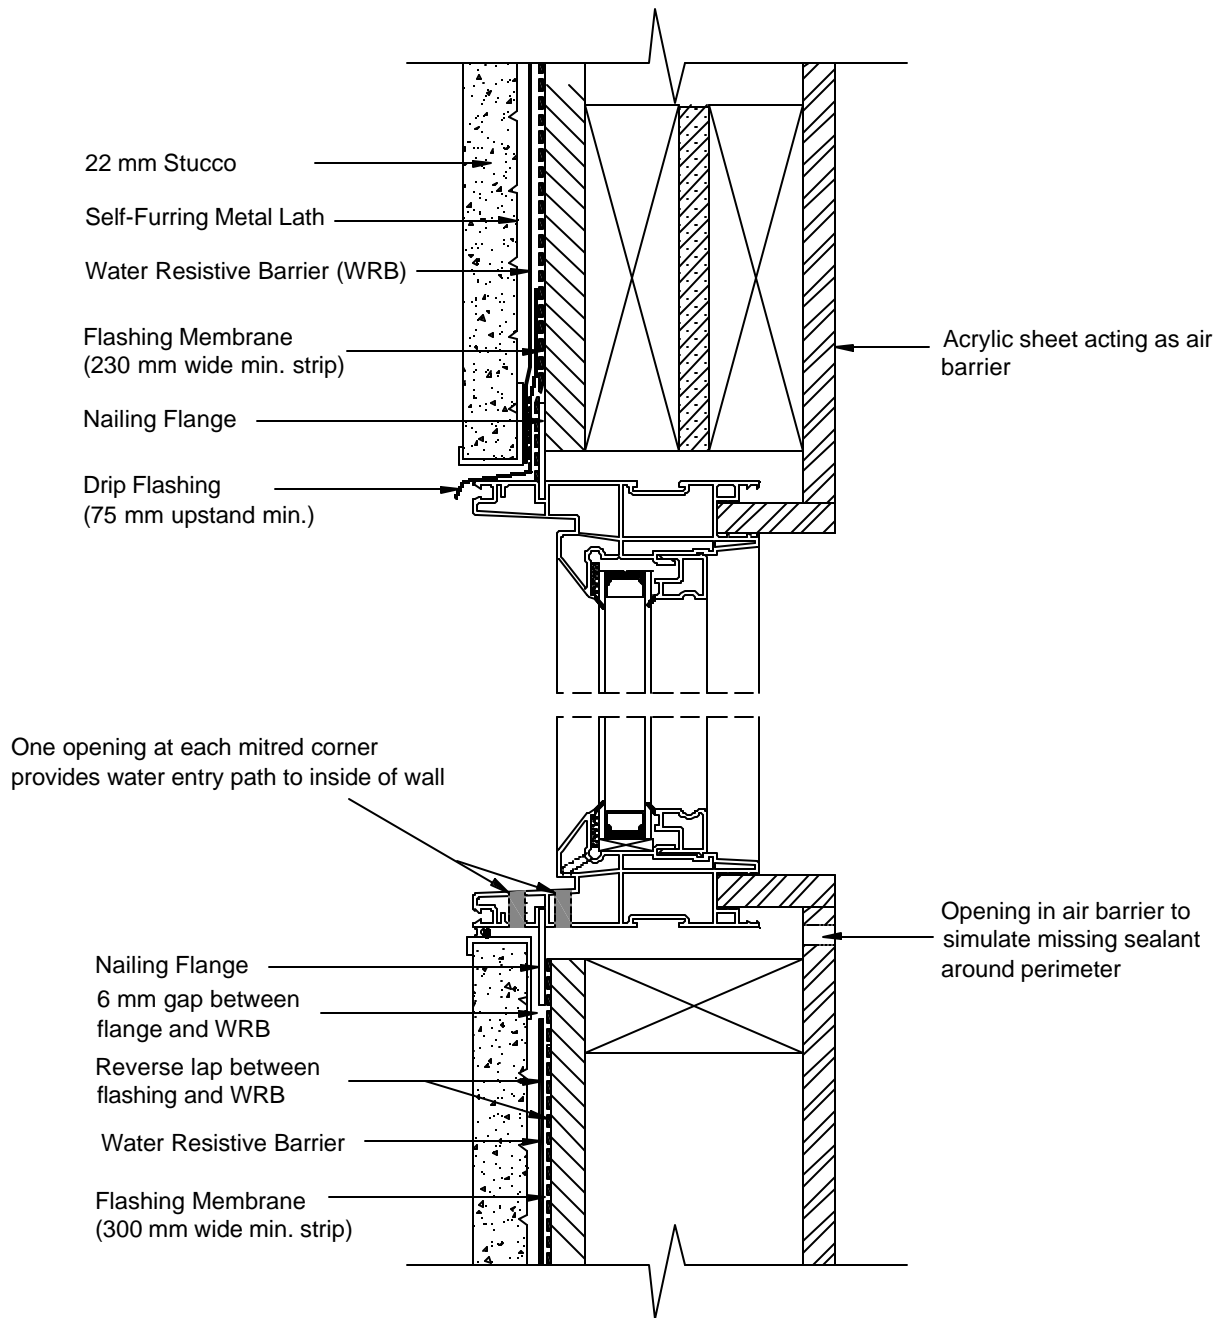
Vertical section of flange-mounted vinyl window installed in a stucco-clad wood-frame wall. Location of holes in window sill for water entry into the wall assembly
